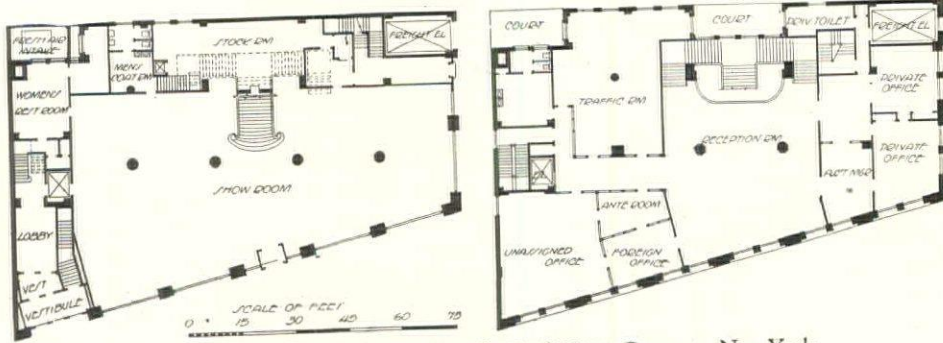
Floor Plans, Sales Building for Ford Motor Company, New York
